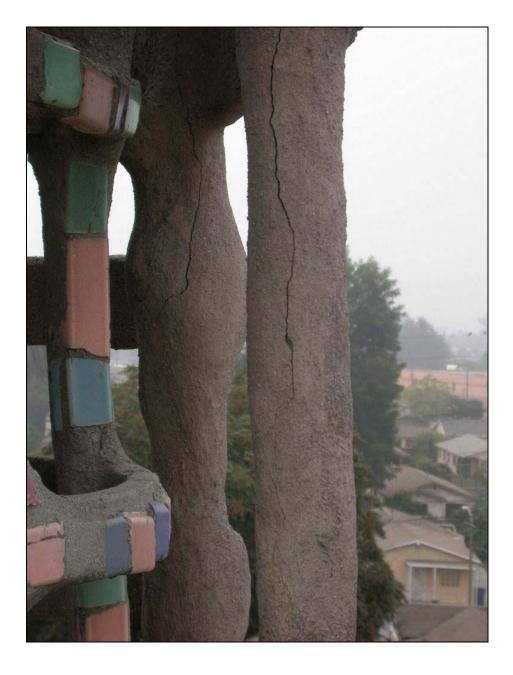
Crack on Center Tower at exterior column in an area of previous repair.
